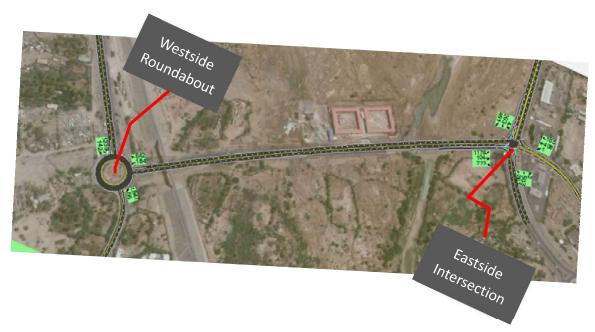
Palmeraie Road Intersection and Roundabout
